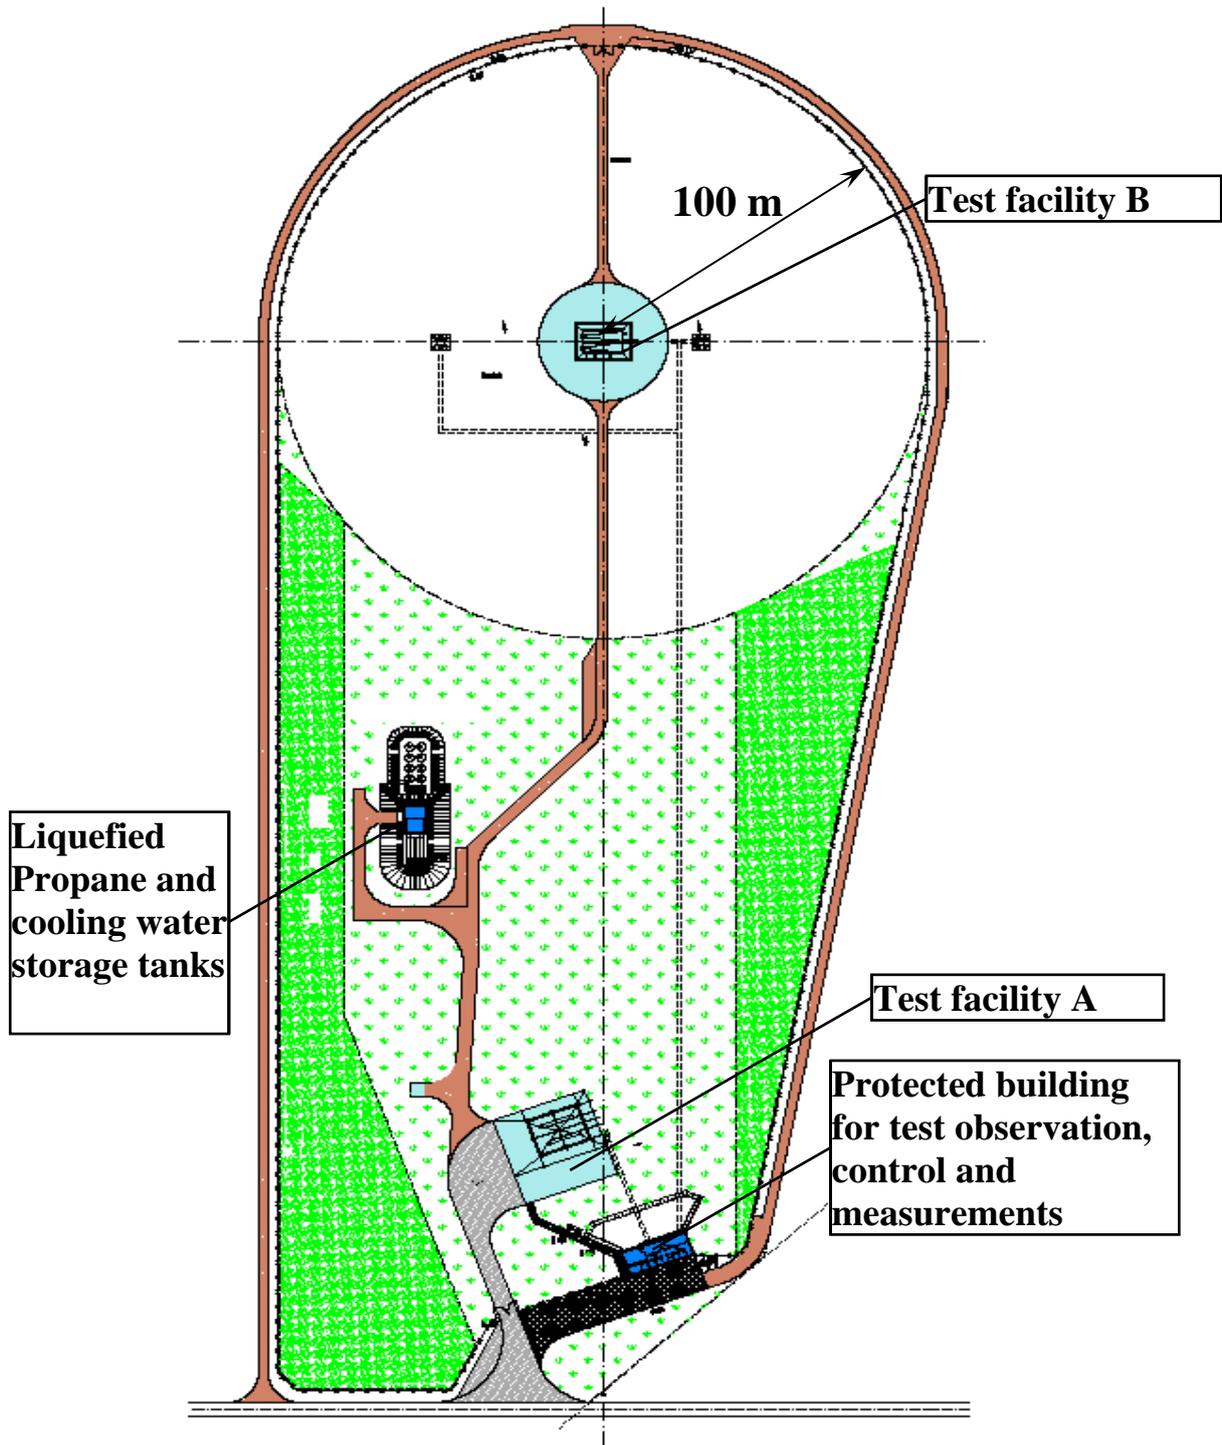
Site plan of the new fire test facilities at BAM Test Site Technical Safety (TTS)
